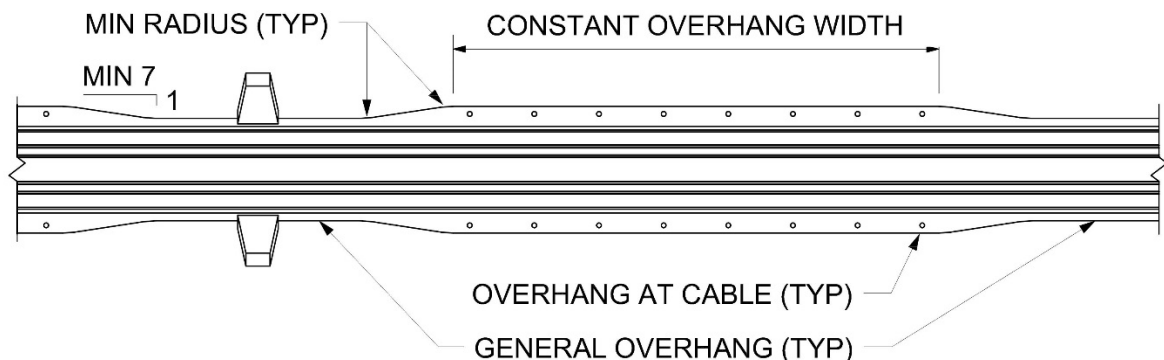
A: Tawatinâ Bridge Overhangs at Cable Anchorages (dimensions in mm)
